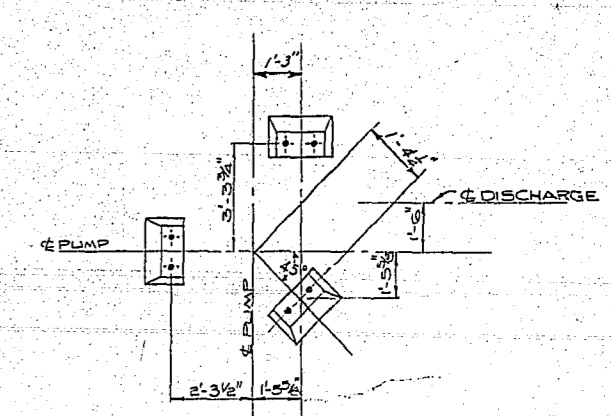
DETAIL OF COVERS FOR FUTURE NO. 3 INSTALLATION SCALE: 1/2" = 1'-0"
